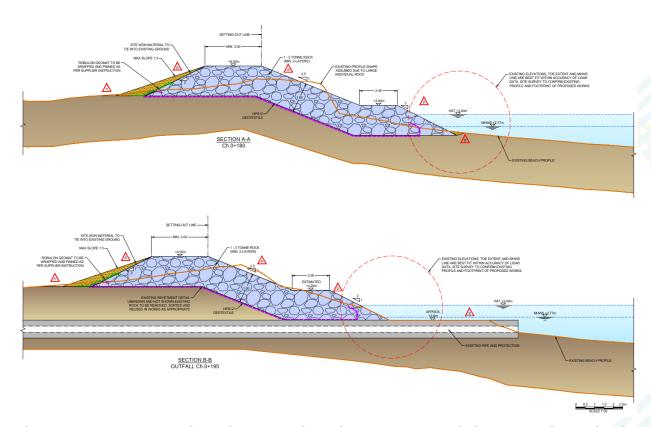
Cross section of proposed works at Great Porth (Great Par) North of Great Carn (HR Wallingford, 2022)
